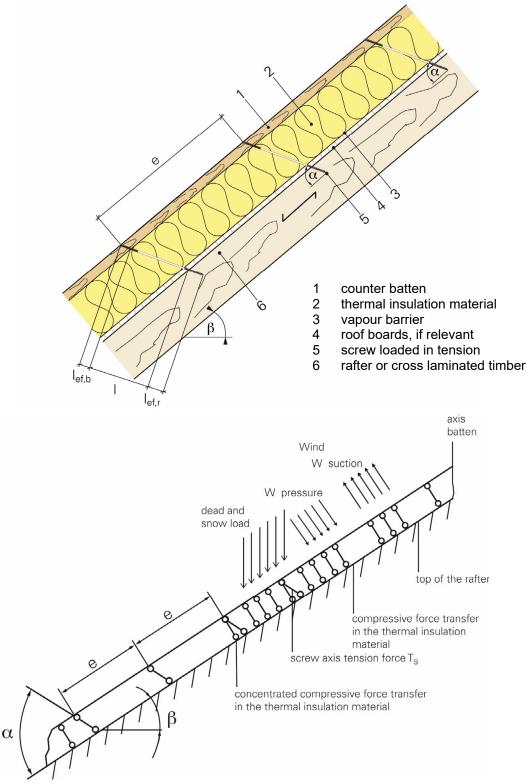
Fastening of the thermal insulation material on top of rafters – Structural system of parallel arranged screws
